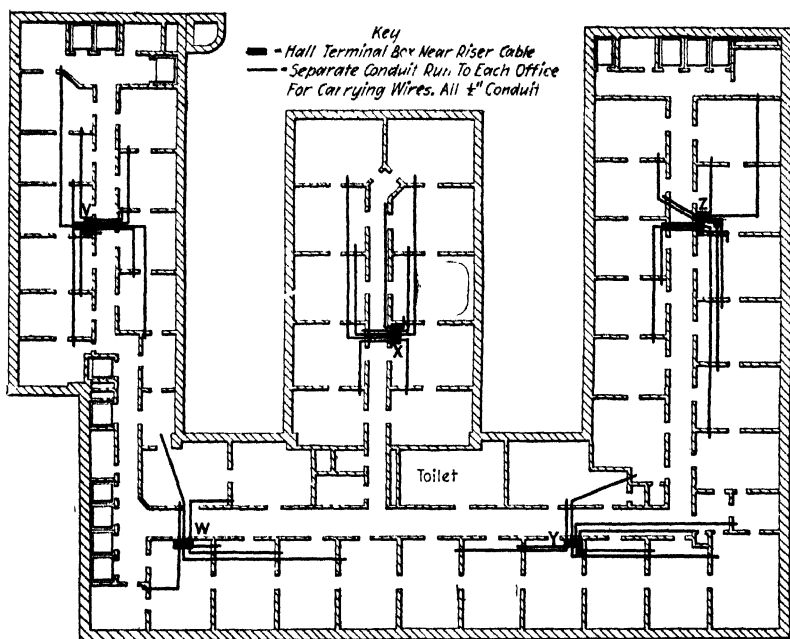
Typical floor plan of 11-story office building showing conduits for telephone circuits. See Fig. 639 for corresponding riser diagram.
